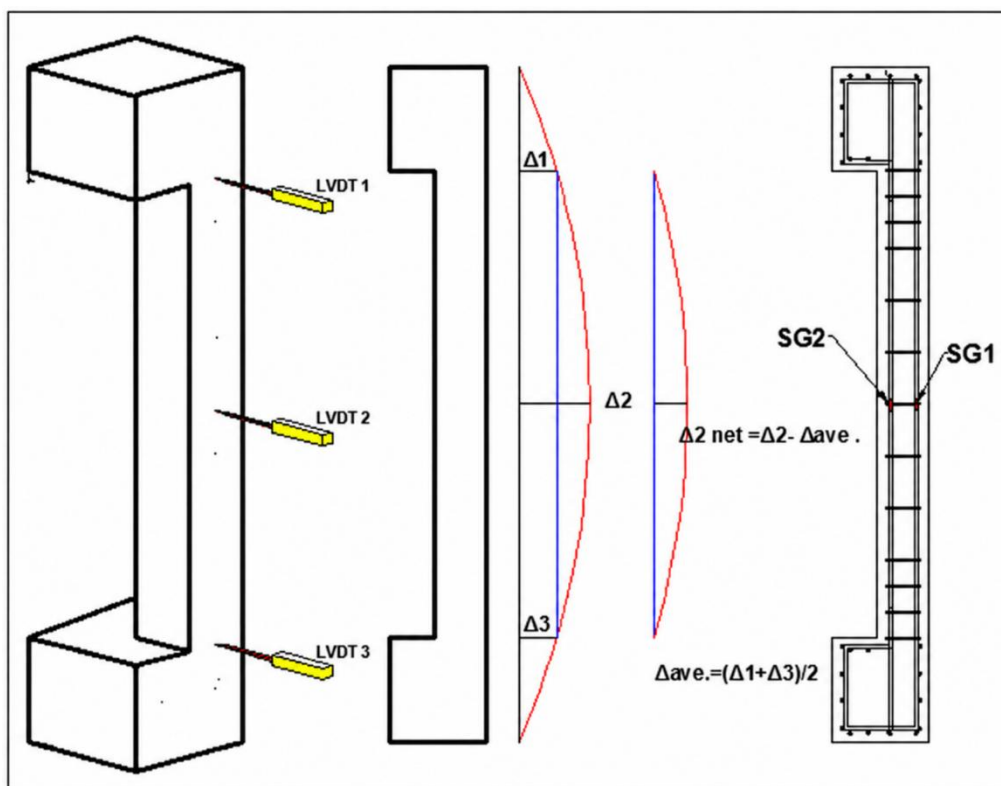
Layout of the LVDTs and strain gauges installed on the longitudinal bars.
